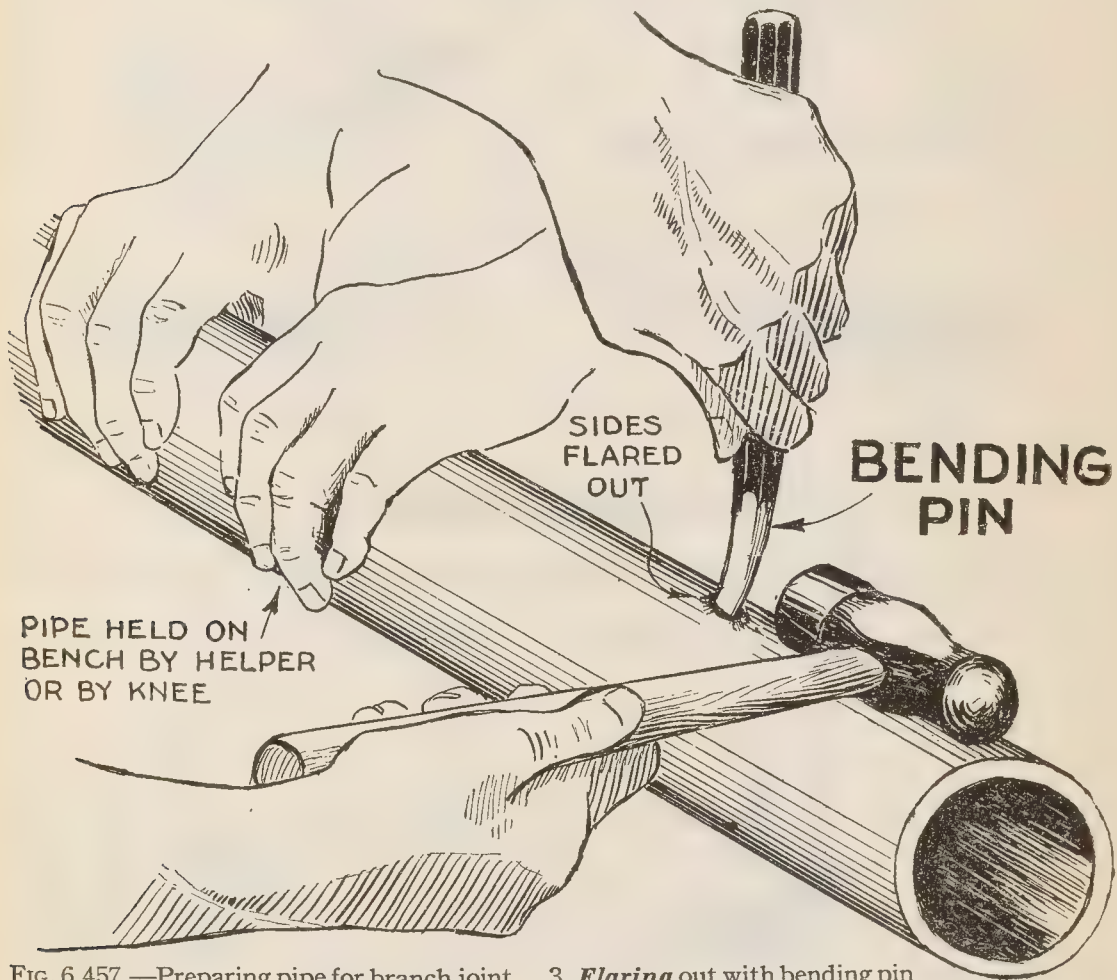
,457.—Preparing pipe for branch joint. 3. *Flaring* out with bending pin
